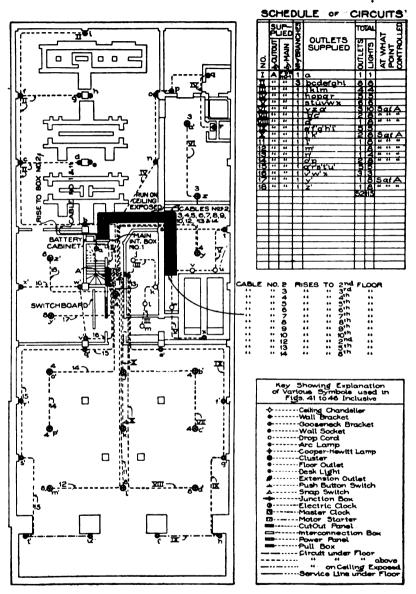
Wiring an Office Building. Basement Plan Showing Branch Circuit Wiring for Outlets in Basement. Location of Main Switchboard, and Trunk Cables of the Interconnection System Providing Wires for Telephone,
